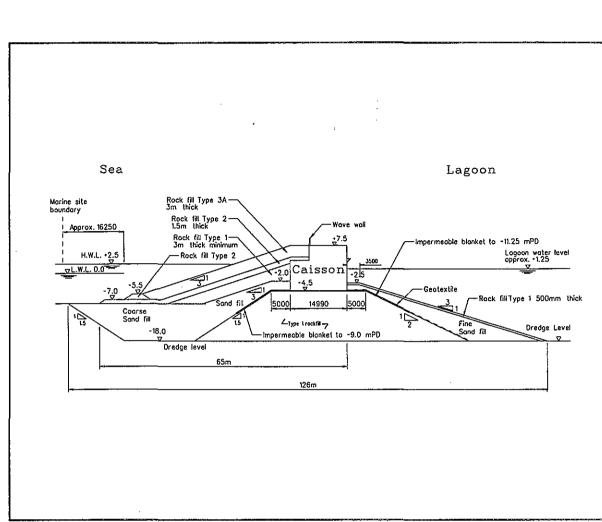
Half Trapezoidal Perimeter Section (Revetment with Caissons)
